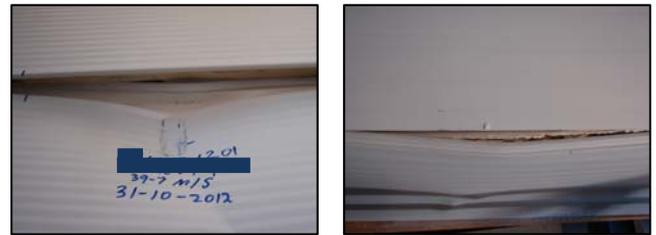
Impact location next to panel joint: front view (left); rear (right).
